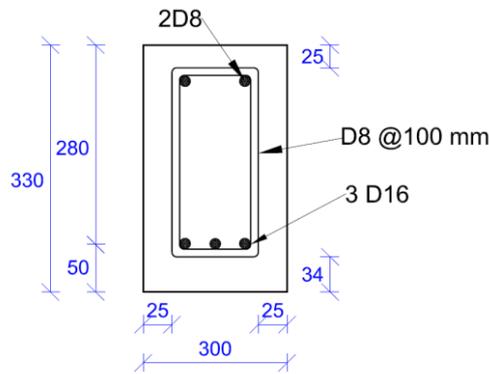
and 2b show the longitudinal and cross-sectional details of the beam specimens, respectively. The test specimens comprised eight (8) full-size rectangular RC beams (150 mm in width, 330 mm in depth, and 2100 mm in length). The beams had a total span between supports and a shear span of 1900 mm and 550 mm as shown in Figure 2a. The specimens were grouped into two sets with four number of beams in each set. Each set includes one reference specimen (without strengthening) and three strengthened specimens. The first set has no internal shear reinforcement
